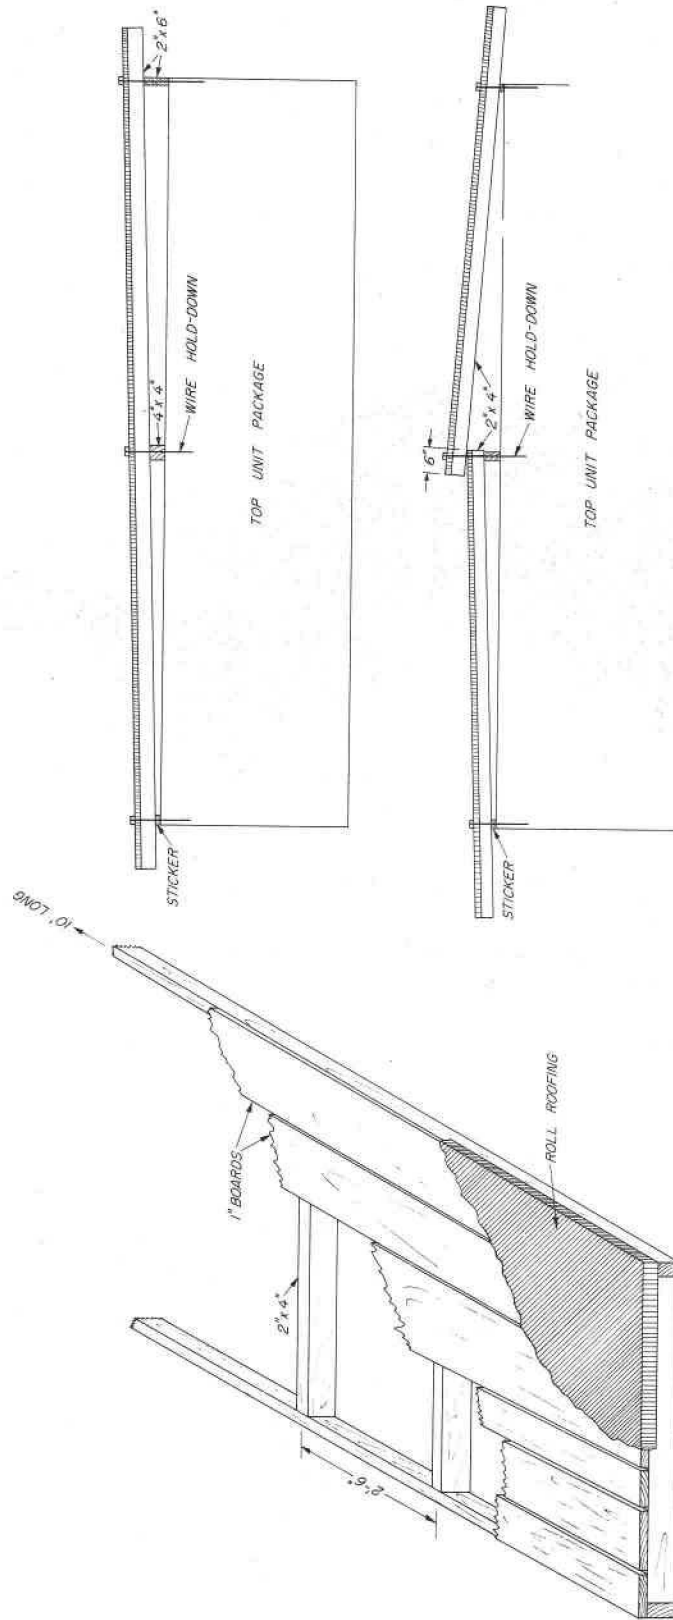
Panels for roofing package piles may be made in single, full-length units or in double, half-length units.
